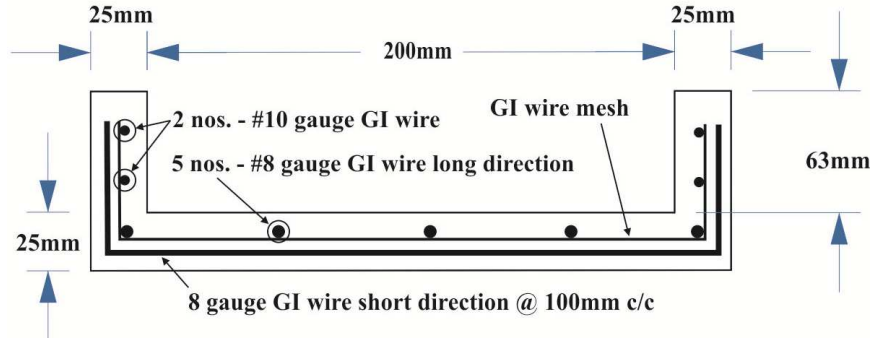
Cross-section of the tray of the TSS with reinforcement detailing
